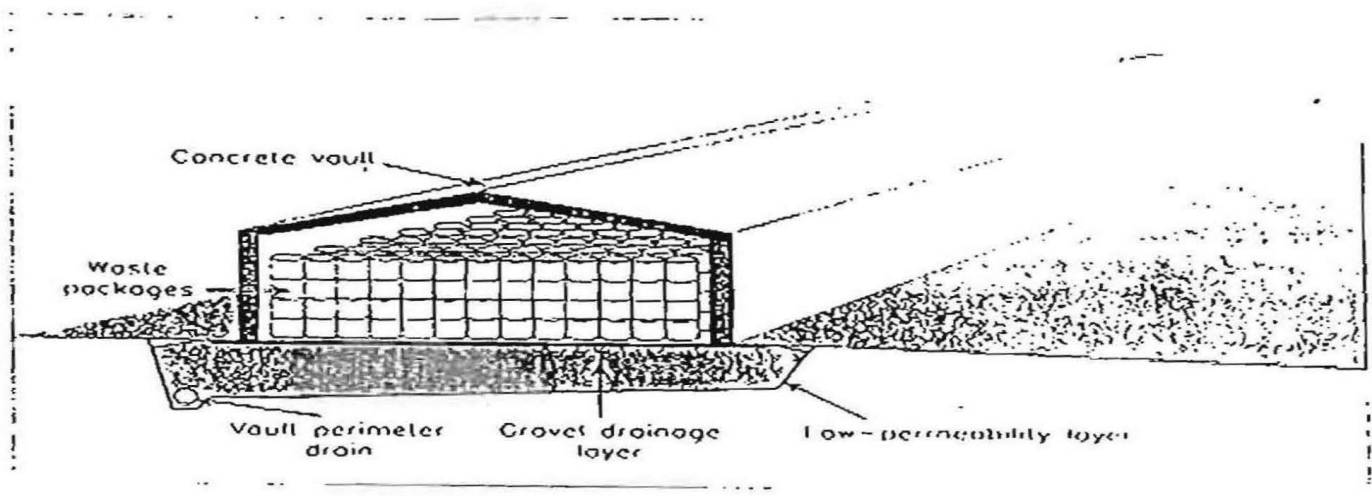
Above-Ground Vault Disposal Facility⁶²
